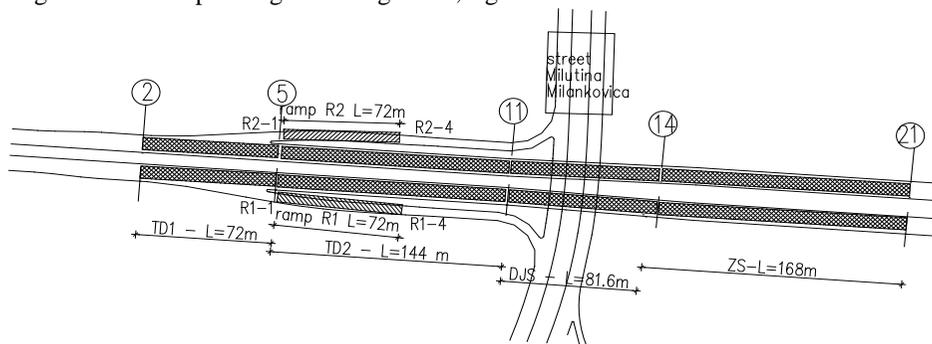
Layout of viaduct structure – part of *Ada bridge* north accessing roads in Belgrade
